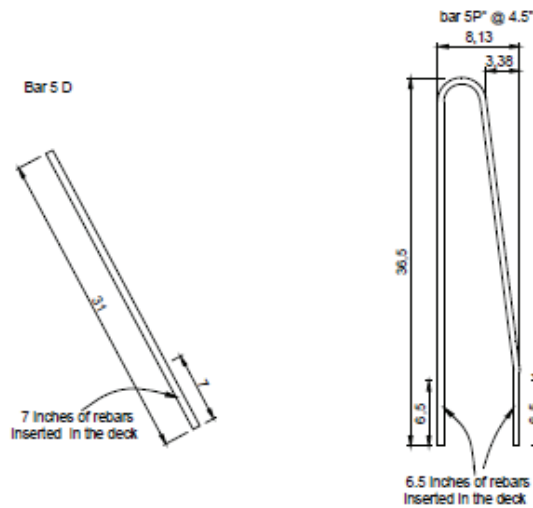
Rebar used in Halls River Bridge, typical section A-A North Side
